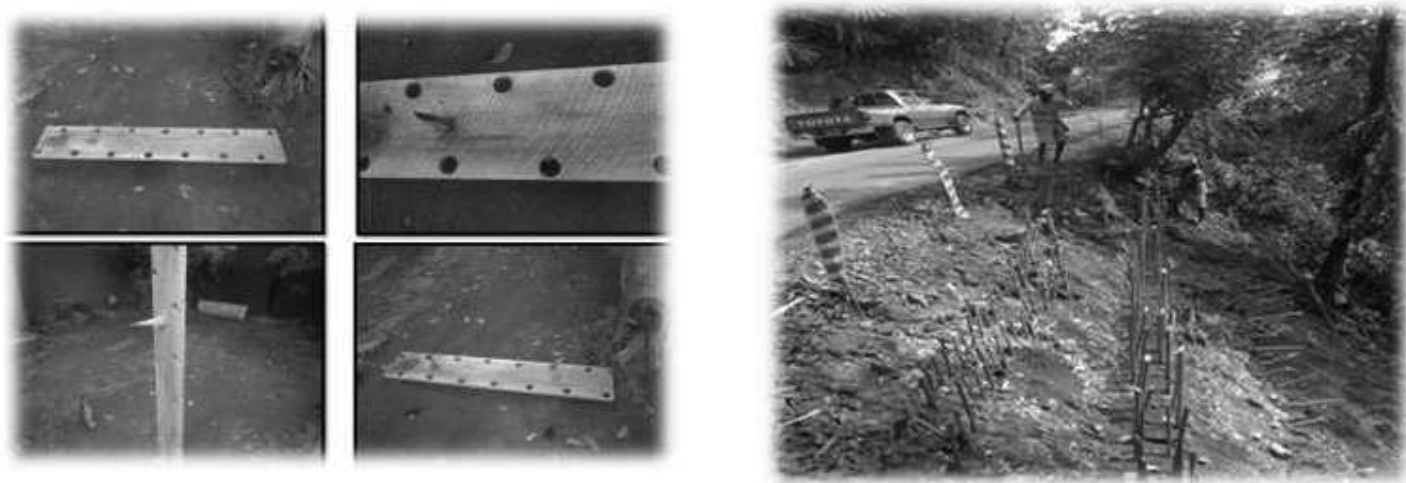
Planting pad used to plant pegs of Glyricidia for better soil (slope stability)
